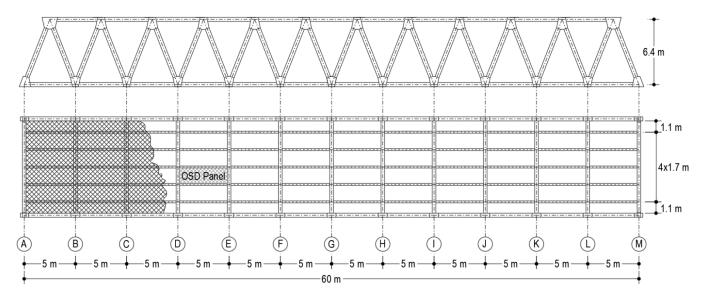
The A-Class Steel Truss Bridge Bina Marga Design Standard with 60 m Spans (Directorate General of Highways, 2005)
